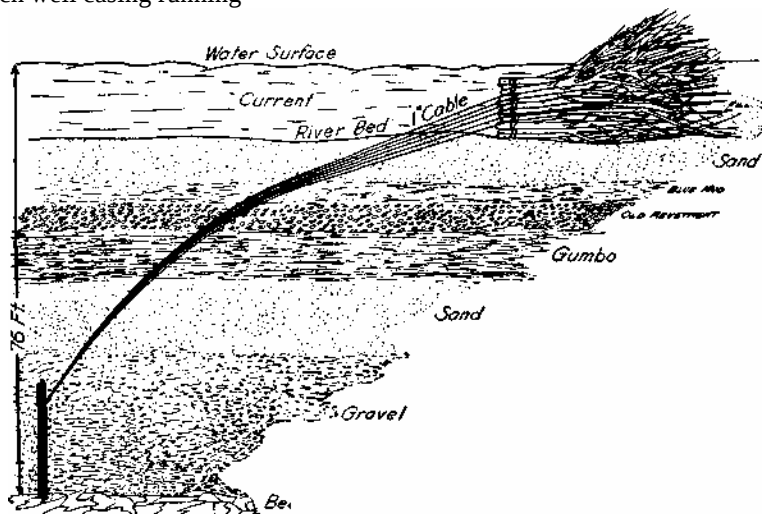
Cross section of retard with submerged anchor piles. (Courtesy Woods Bros. Construction Co.)
